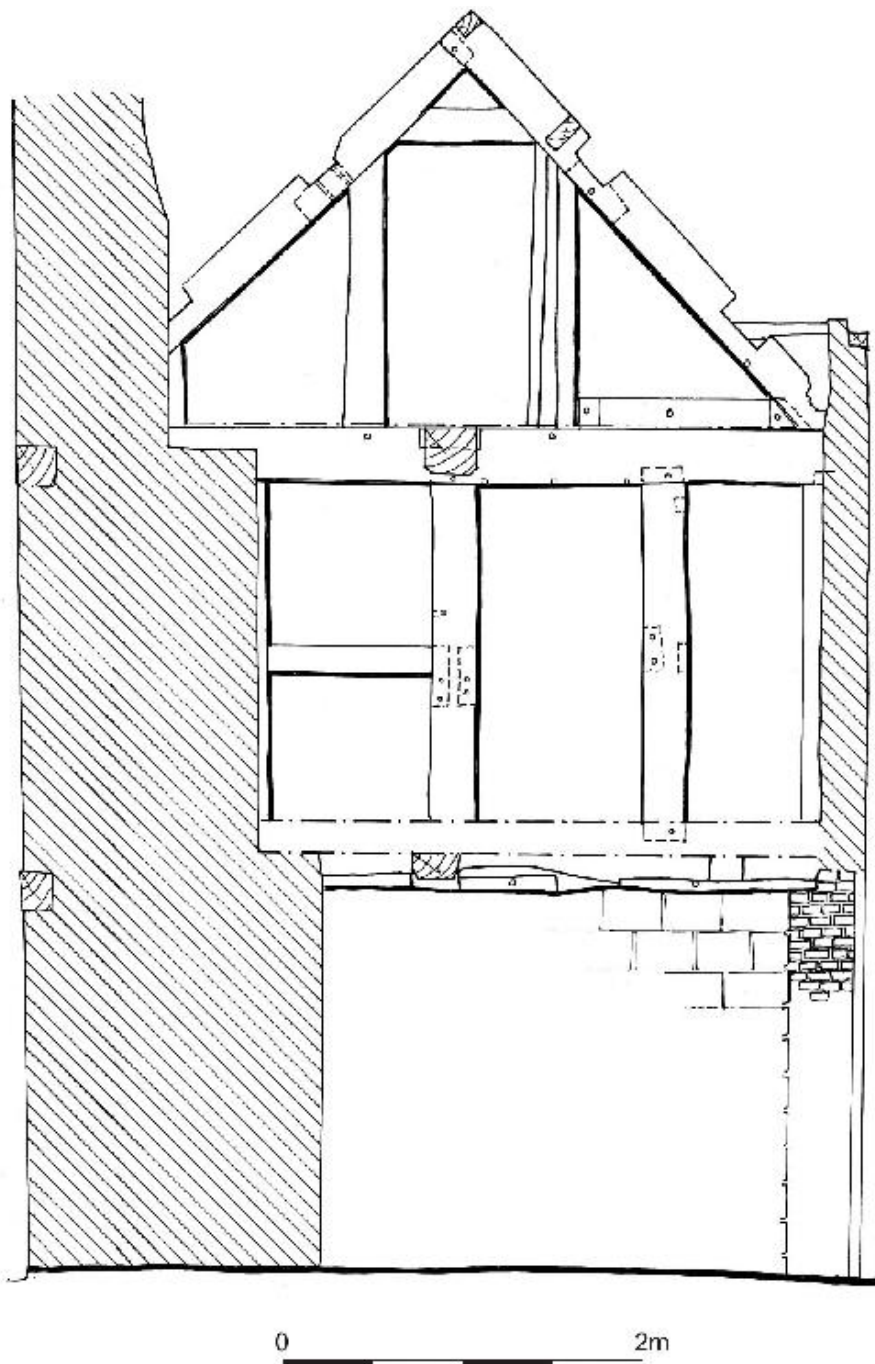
The north face of the internal cross-frame of 64–66 Widemarsh Street
